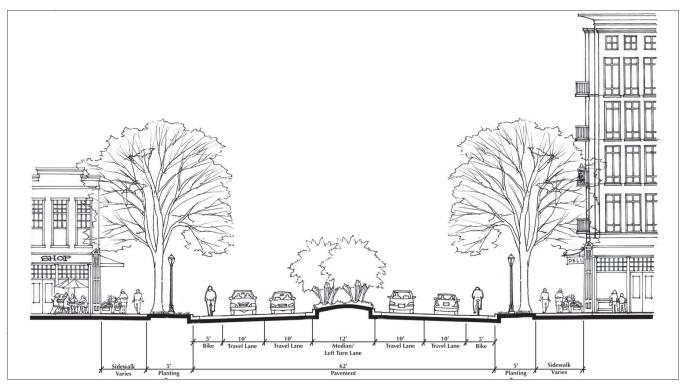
Recommended North Avenue section, between Piedmont Avenue and the Belt Line bridge
